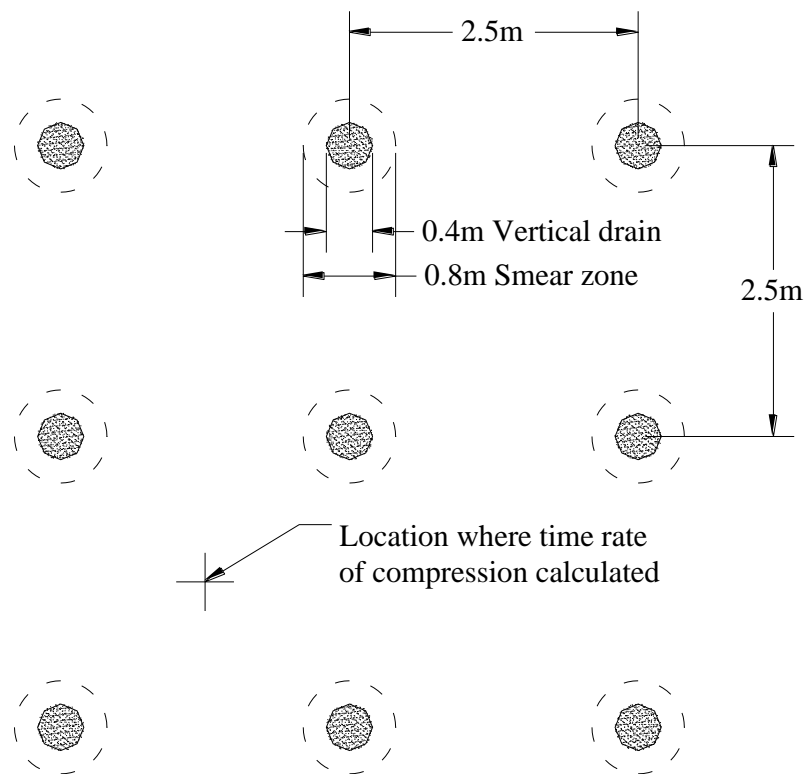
Plan view of vertical drains fully penetrating Ma13 at Kansai Airport.
